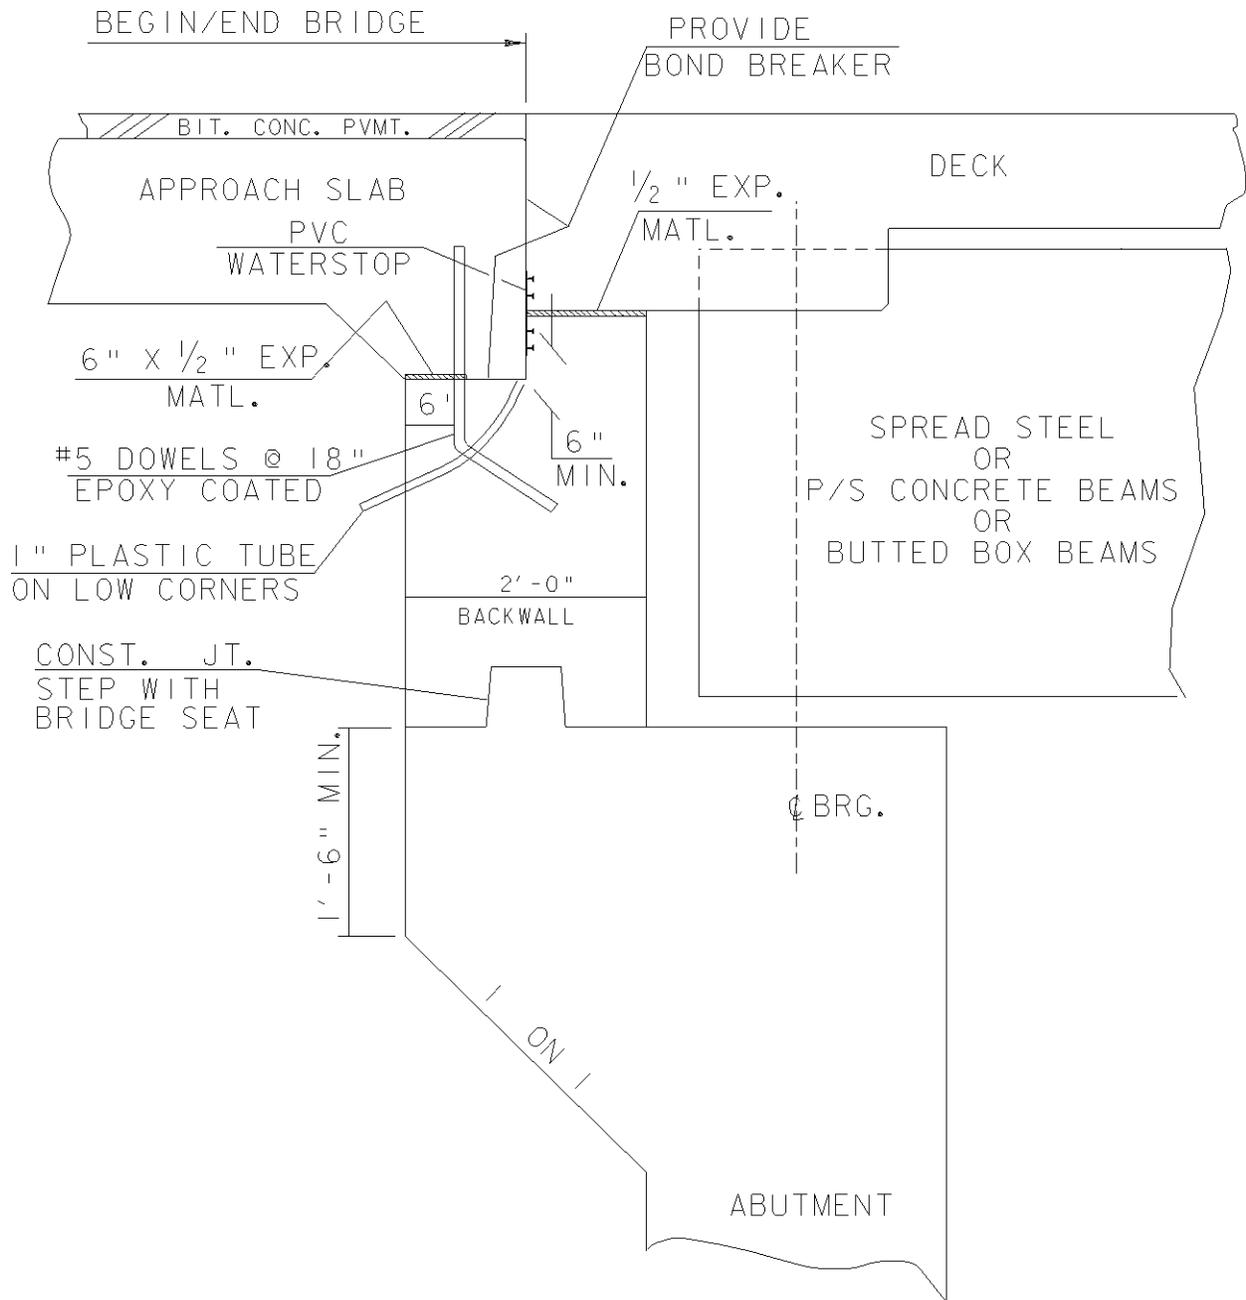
1 Type G – Bridge End for Long Spans with Spread Beam Decking or Intermediate Spans with Butted Box Beams decking, both with Approach Slabs.
